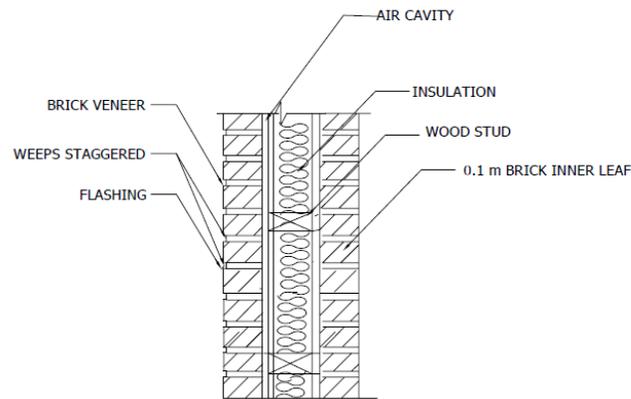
Details of wall assembly with 0.1 m brick wall in the inner leaf
